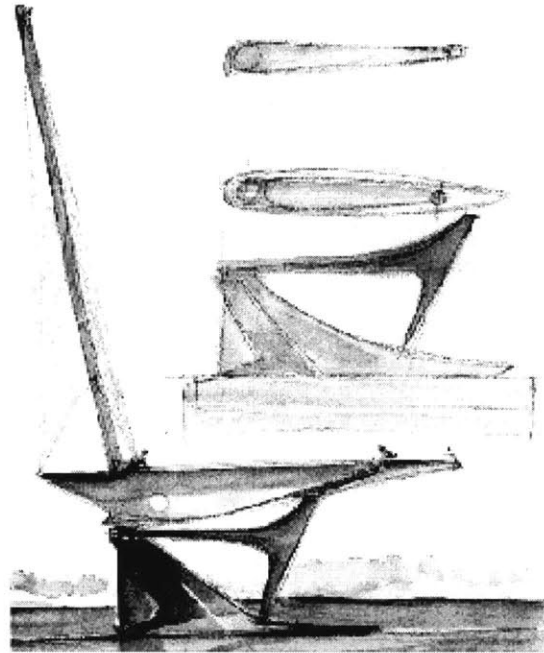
Calatrava sketch of the cross section of the Orleans Bridge
